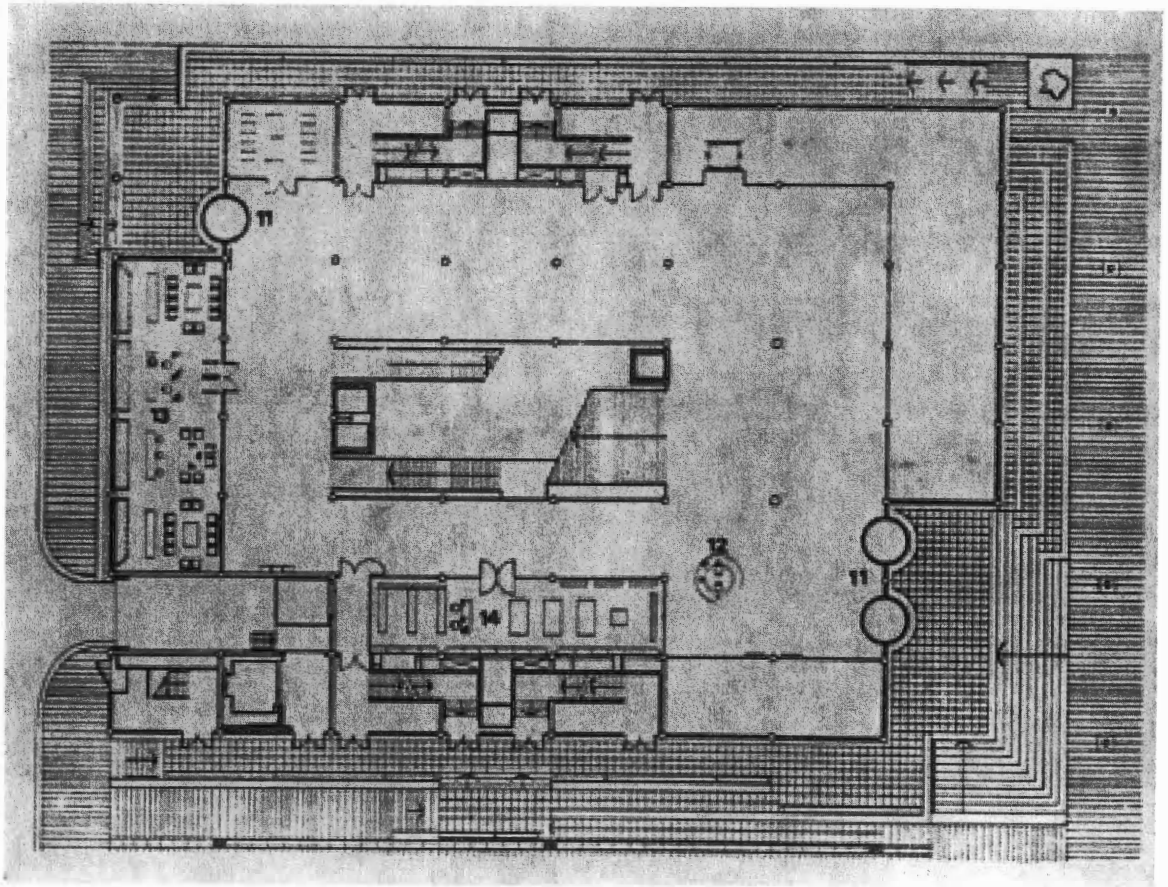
, *CARREE D'ART, GROUND LEVEL PLAN (MORRIS)
